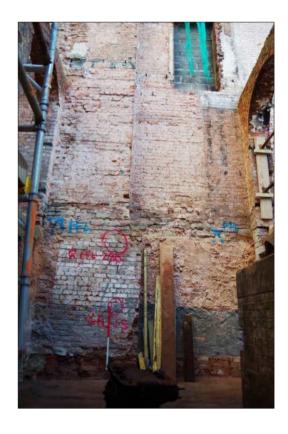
The middle basement, southwest wall, looking southwest. (1m scale)
